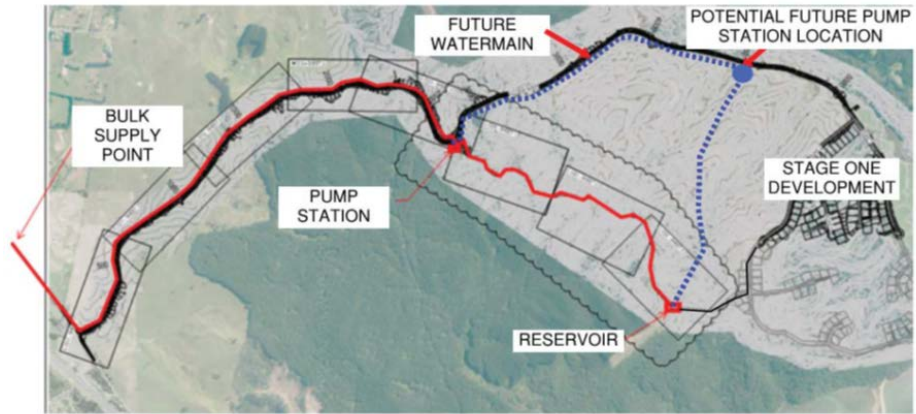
Proposed plan of Water Infrastructure (as per agreement)
